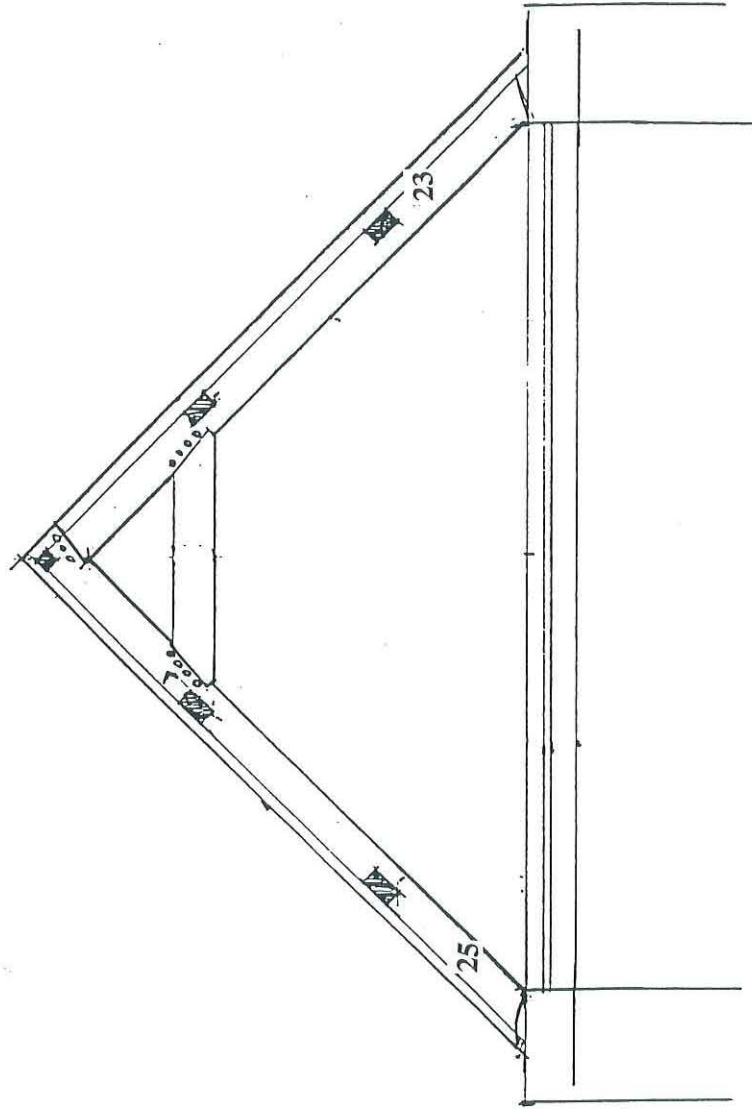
South range roof truss 4 (viewed from the west) to show sample locations
